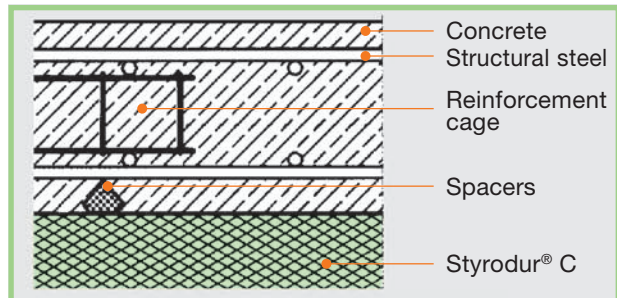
Walkable spacers made of fiber-reinforced concrete for the bottom reinforcement; reinforcement cage of steel mesh fabric for the top reinforcement of the floor slab.
